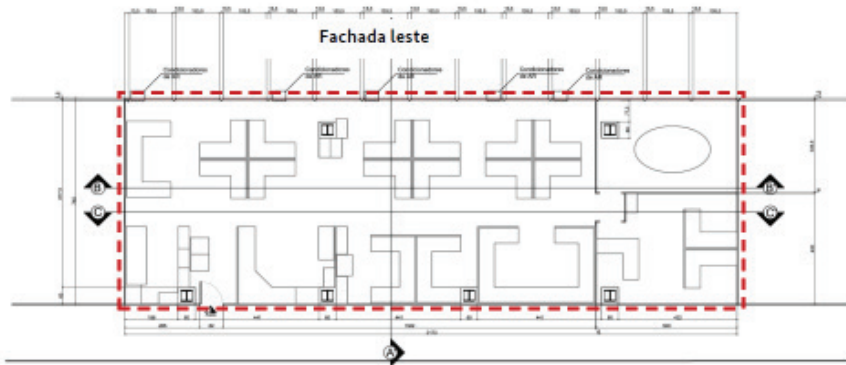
Typical floor of Block C. Mapped by the authors and TU Munich team.
